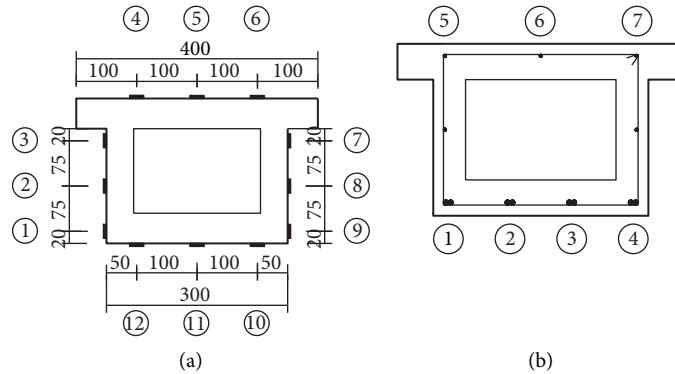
Arrangement of strain gauge of test beam (unit: mm). (a) Arrangement of concrete strain gauges. (b) Arrangement of reinforcement strain gauge.
